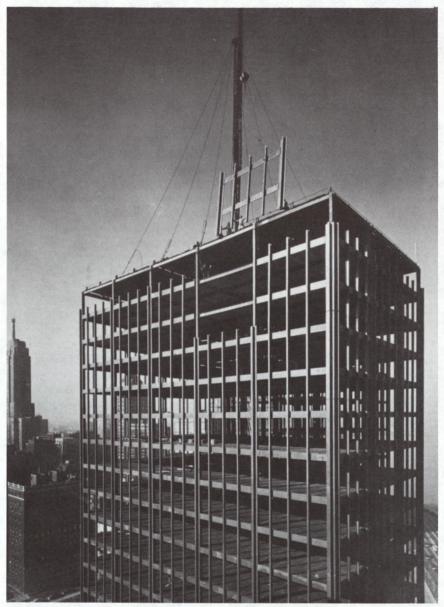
The erection of projecting I-beams at the apartment buildings shown in Figure 7. Photo Hedrich-Blessing.
